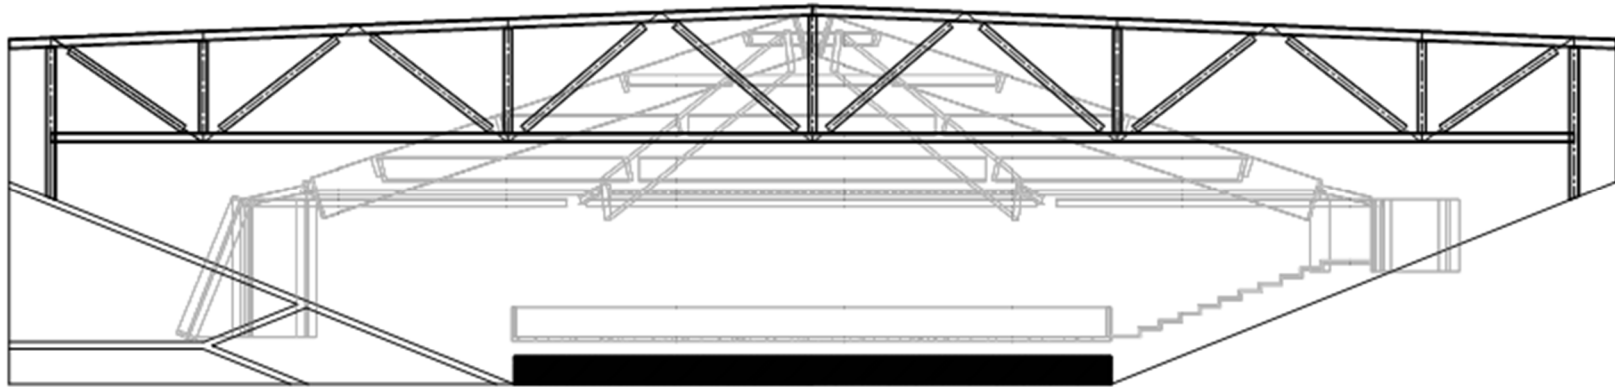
Section of Scheme 4 looking west, showing floor of rink lowered, with consequent lowering of new roof
